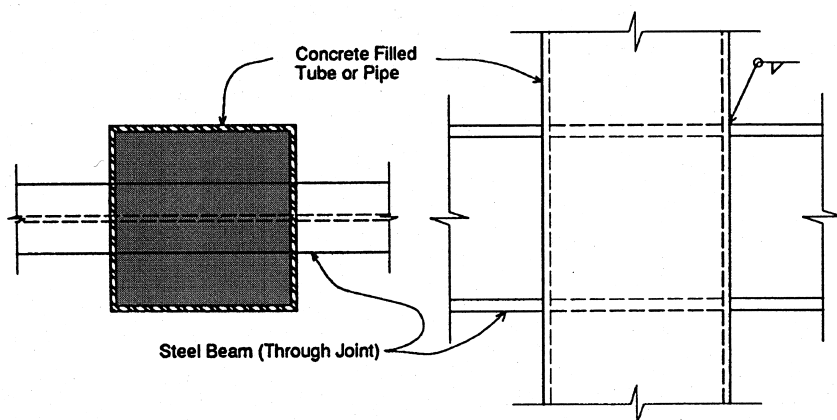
Concrete-filled tube column-to-steel beam moment connection.
